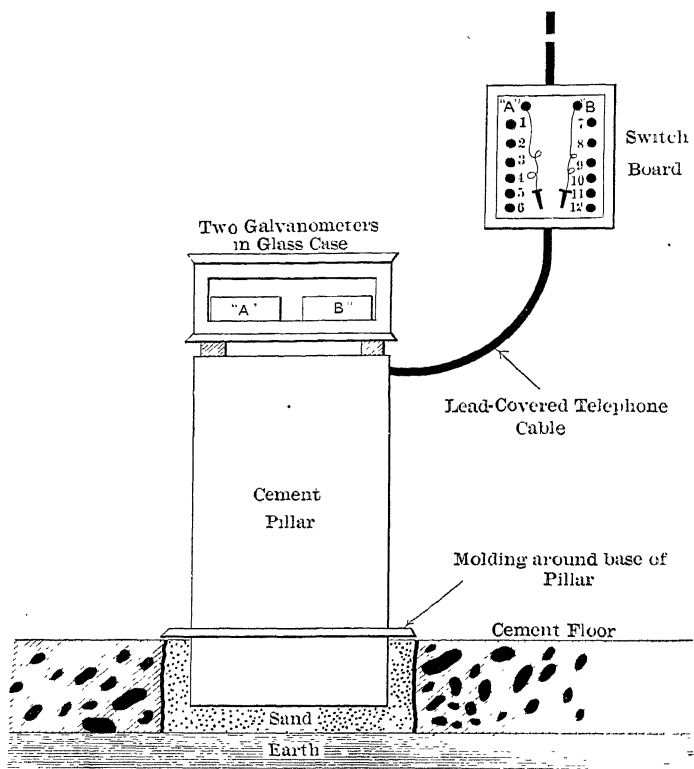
DETAILS OF CONSTRUCTION OF CONCRETE PILLAR.
